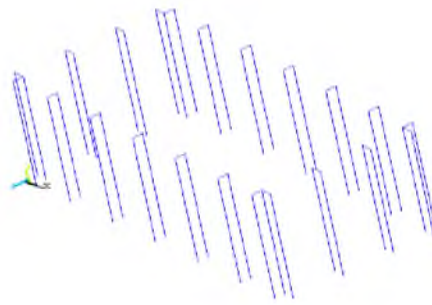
Configurations of containment reinforcement in URM buildings[9]
